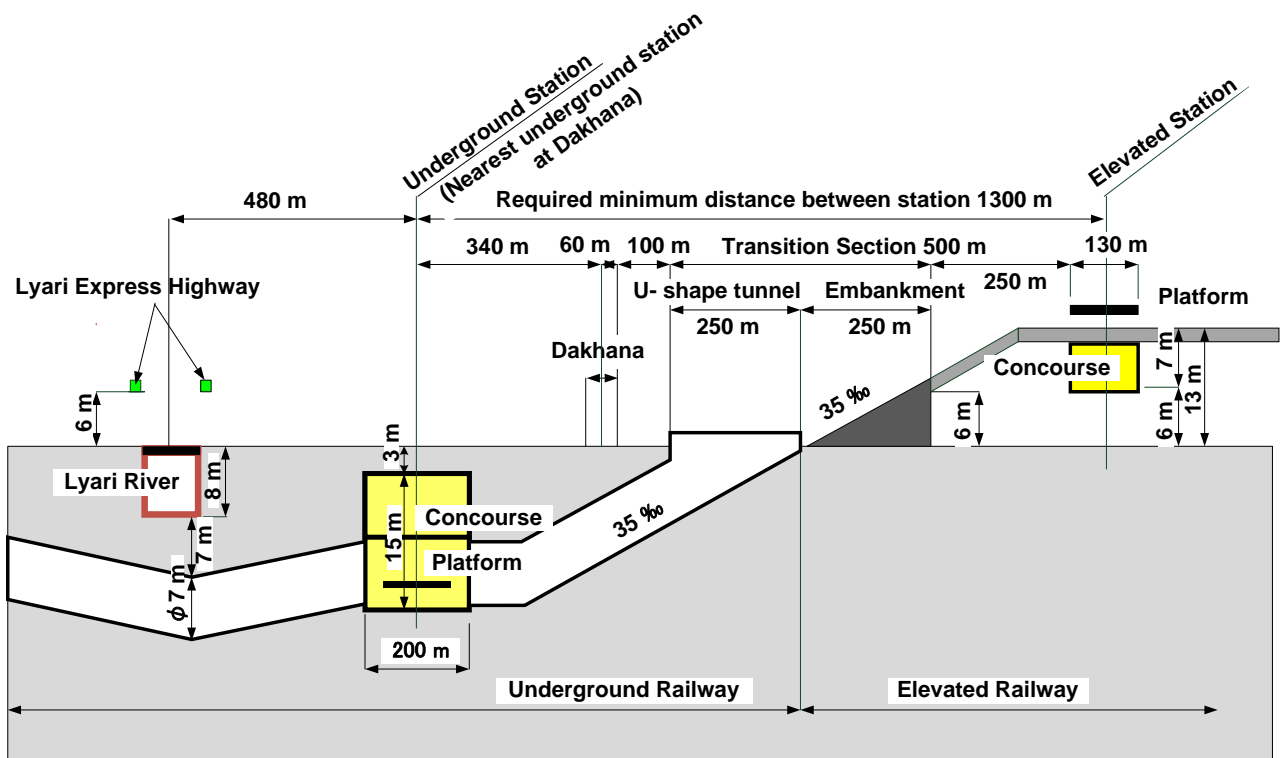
Cross Section of LRT Blue Line under one way section
